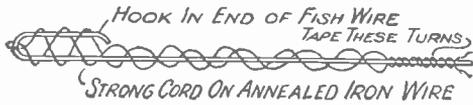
TO MAKE THE WIRE DRAW EASILY
